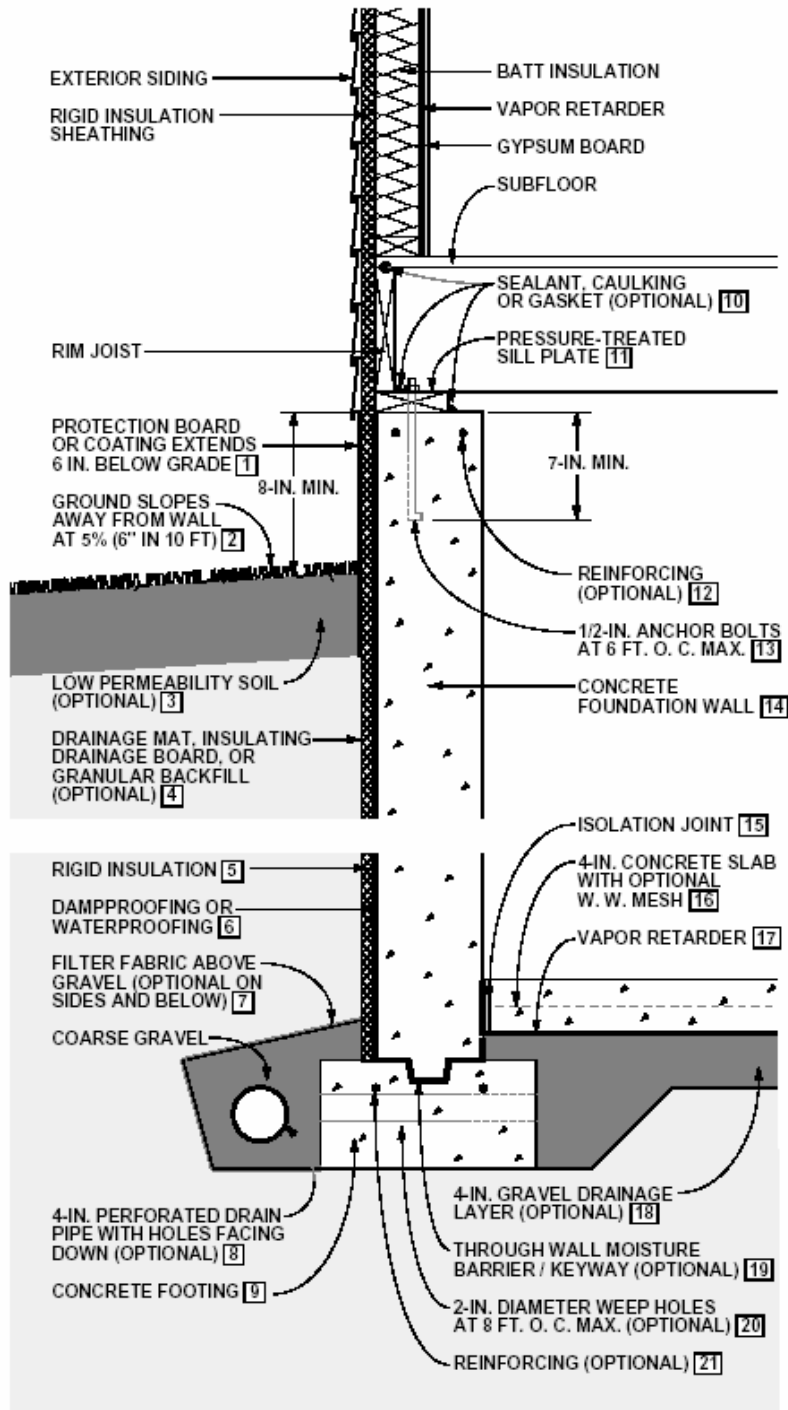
illustrates a concrete foundation wall with exterior insulation. The rigid insulation also serves as sheathing over the 2 x 4 wood frame wall above grade. This approach can be used for rigid insulation that is 1.5 inches thick or less.
